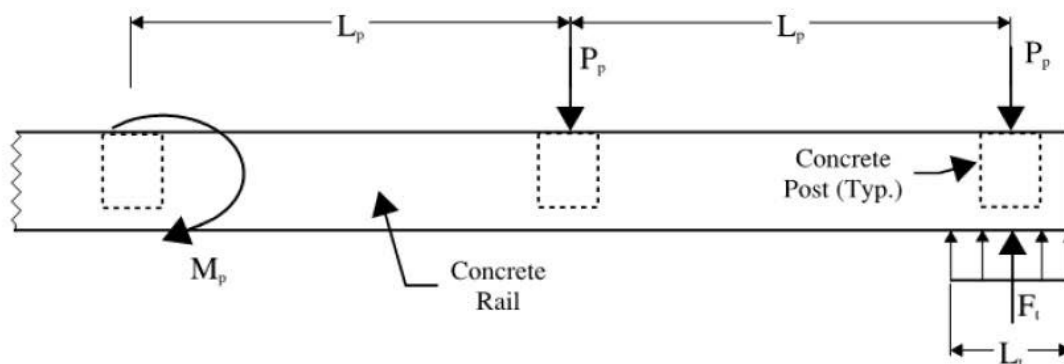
Two-Span Failure Mode for Post-and-Beam Railings at an End Section or Joint
